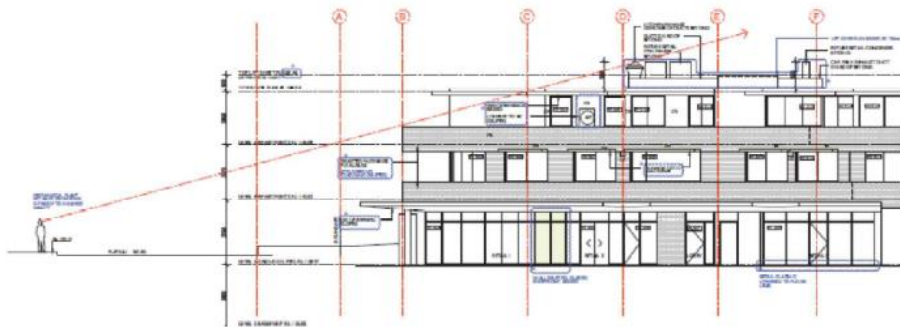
Site line diagram demonstrating that the breaching roof top elements will not be discernible as viewed from the street or surrounding residential properties.
